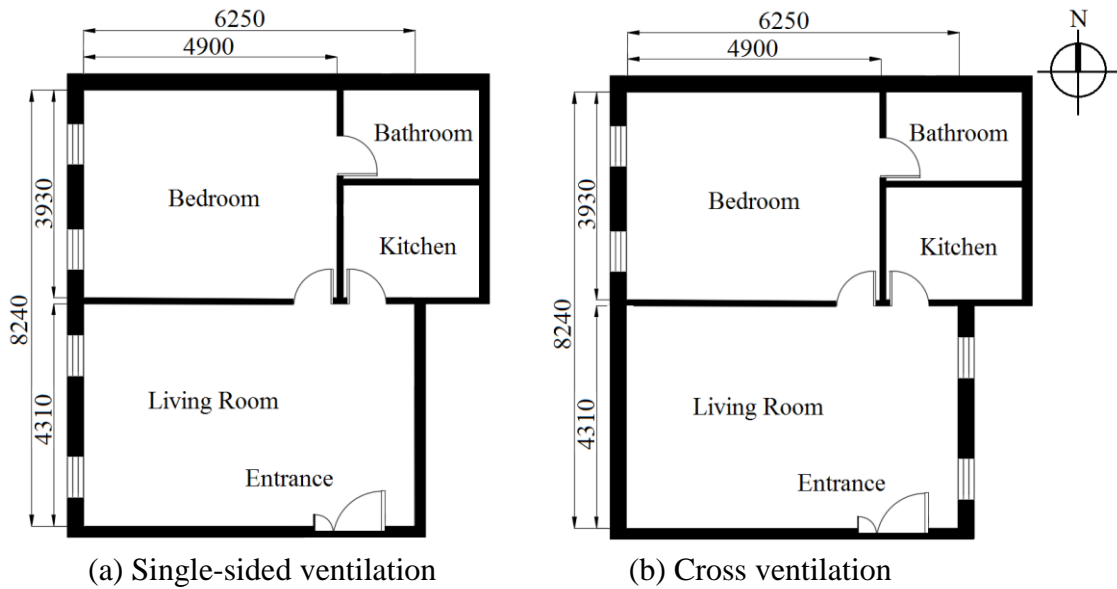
Floor layout of the hypothetical unit (west-facing windows)
